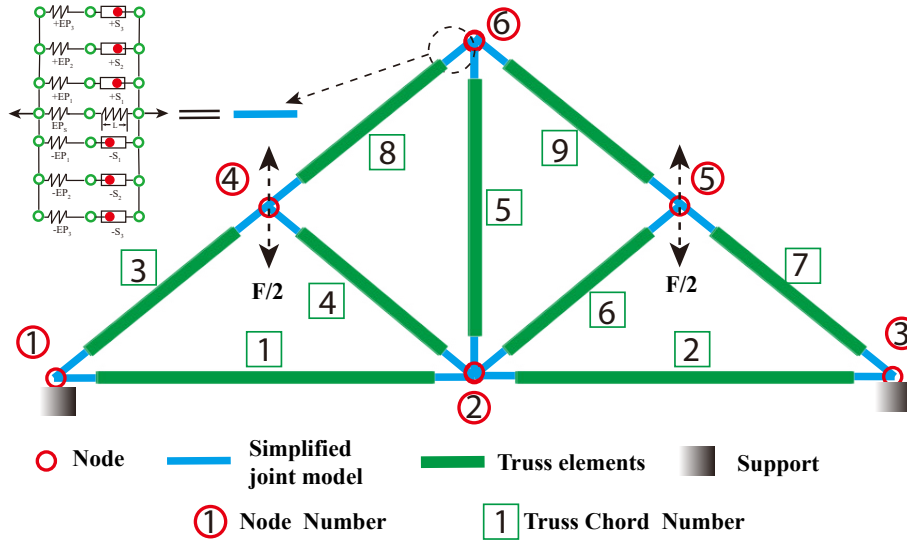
Simplified hybrid roof truss model in ABAQUS.
